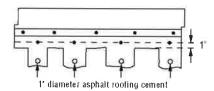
Fastening Presidential and Presidential T/L Shake shingles on sleep slopes.
